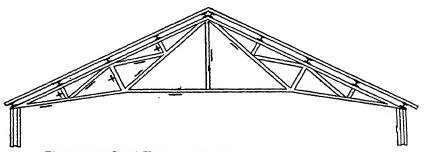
B Steel Truss. Spans from Forty to Eighty Feet
